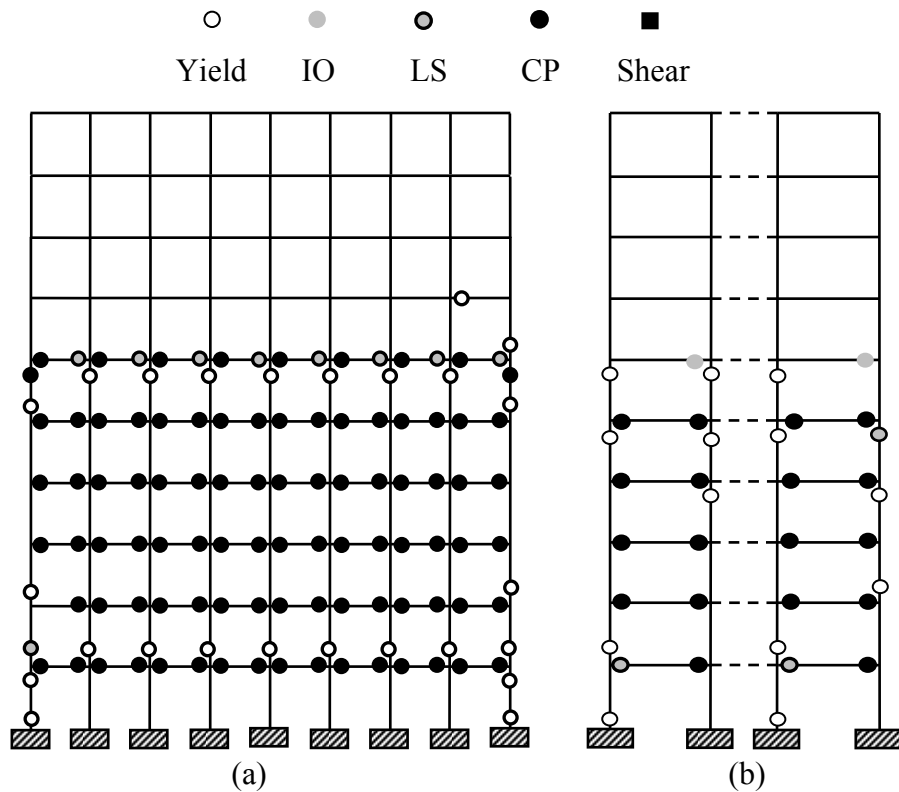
Collapse mechanism of ten storey RC bare frame building, designed for gravity loads only as per relevant Indian Standards: (a) typical longitudinal frame; (b) typical transverse frame.
